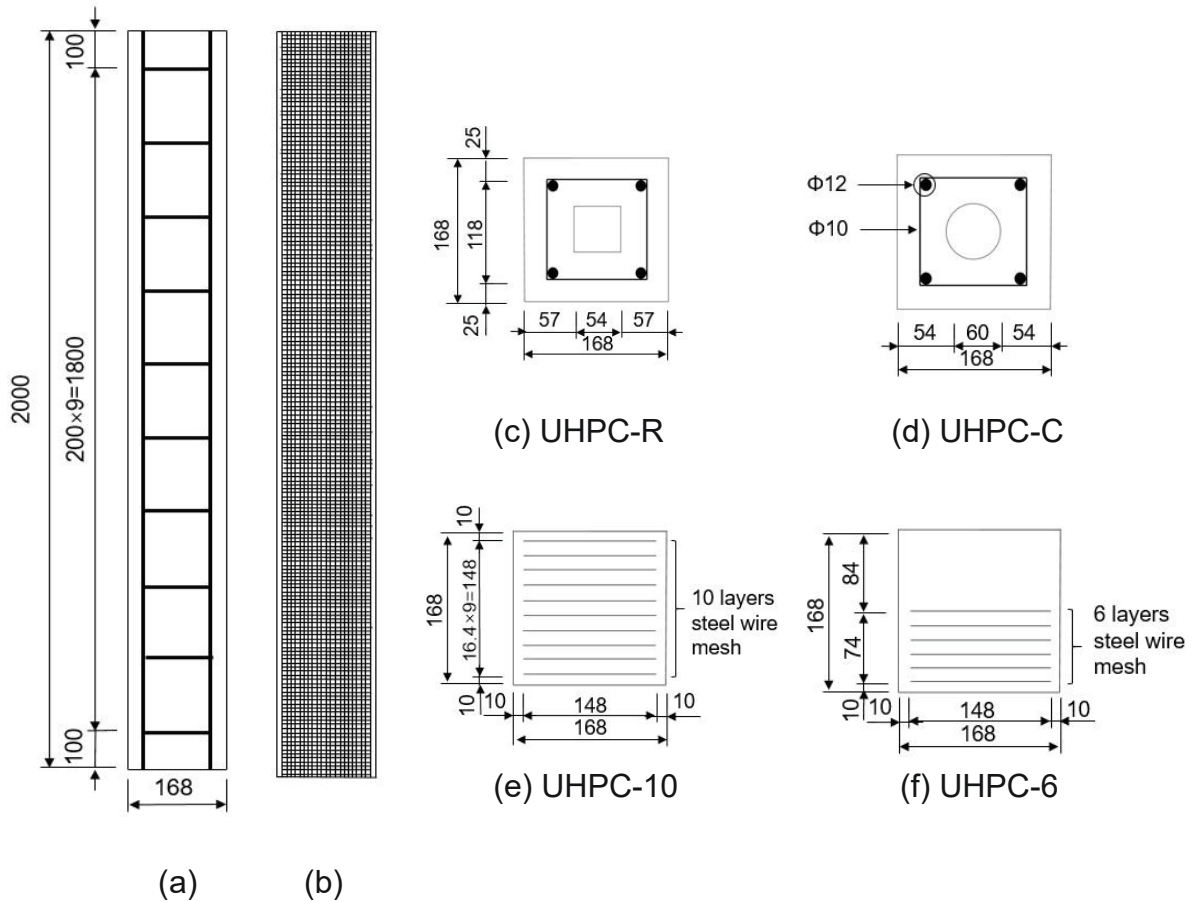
Specimen dimensions (unit: mm): (a) reinforcement details for UHPC hollow-core and RC columns (b) reinforcement details for steel wire mesh reinforced UHPC columns
